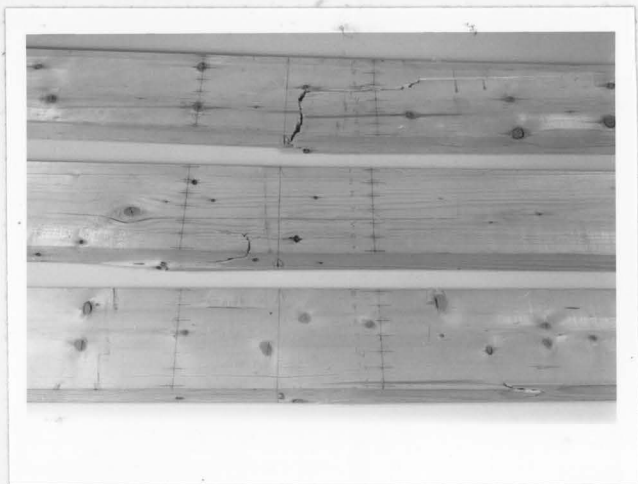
TYPICAL FAILURE IN 2 x 6 KNOTTED BEAMS SUBJECTED TO CENTRAL LOADING
